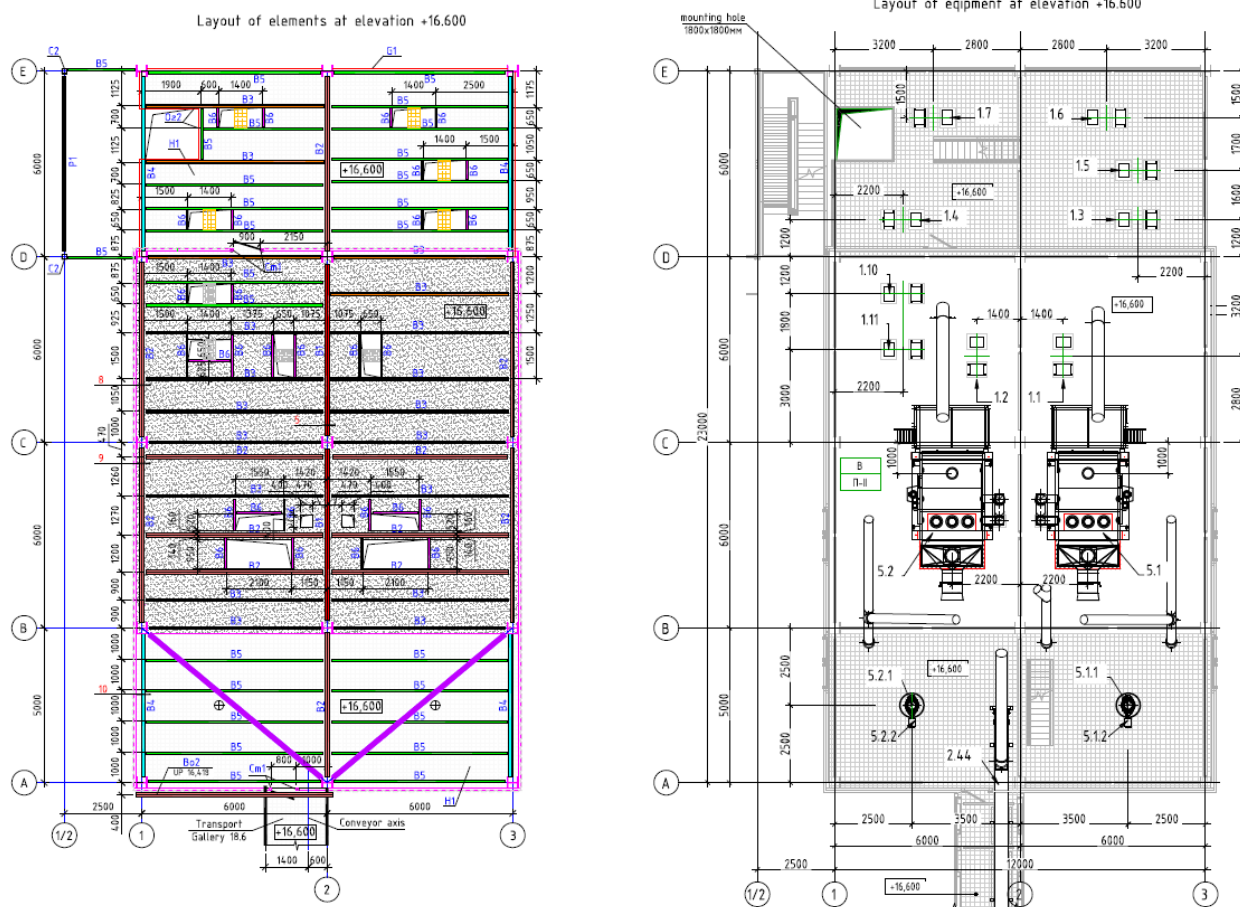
Layout of load-bearing steel elements and the plan at elevation +16.600 [14]
